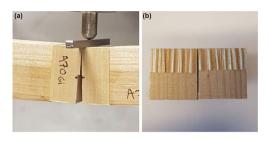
Illustrations of a specimen during and after the fracture energy test. a Propagating crack. b Fracture surface
